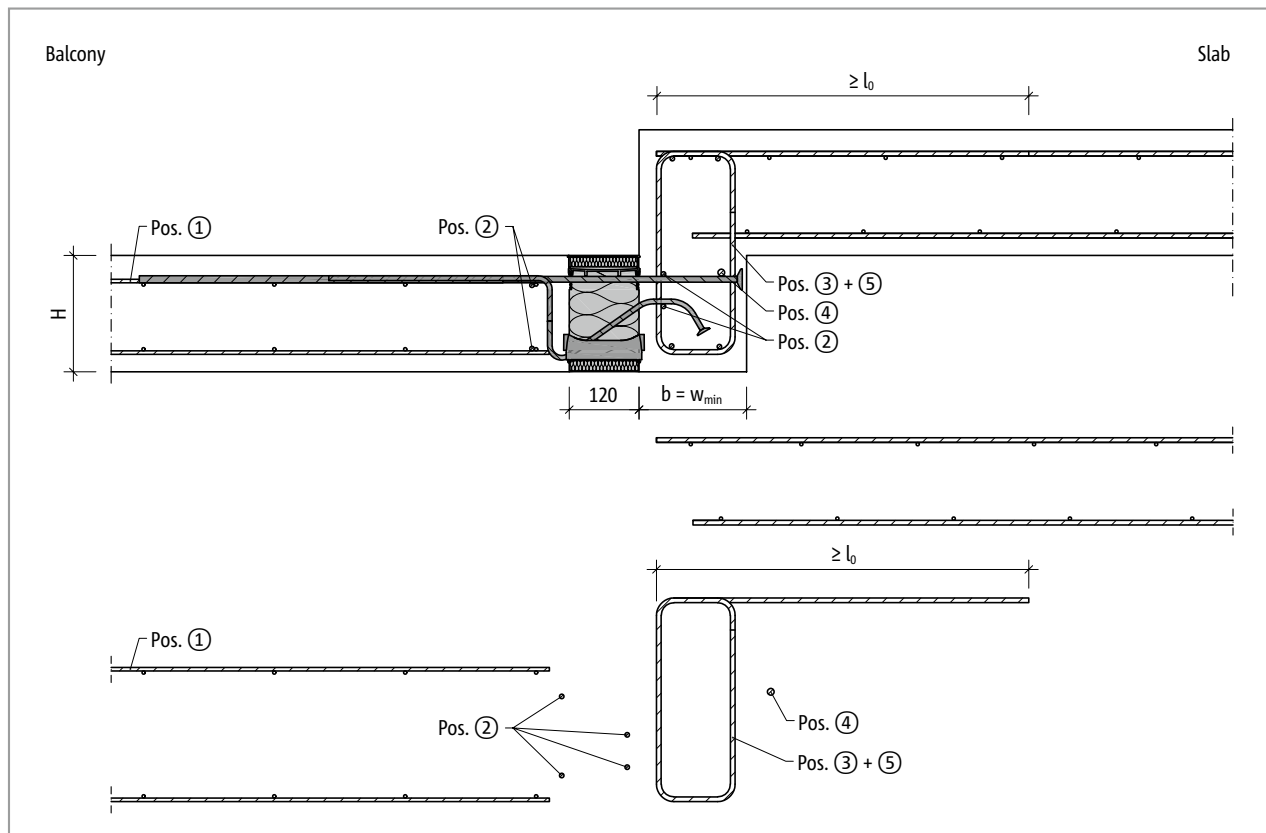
Schöck Isokorb® XT type K-U: On-site reinforcement for balcony with height offset downwards with minimum structural element dimension ( $w_{vorh} = w_{min}$ )
